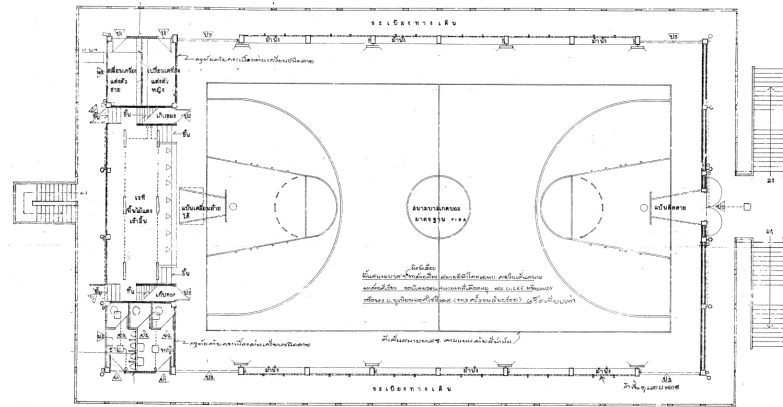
Standard Second Floor Layout of Basic Meeting Hall Office, Education Committee, Room 101, Building 27
